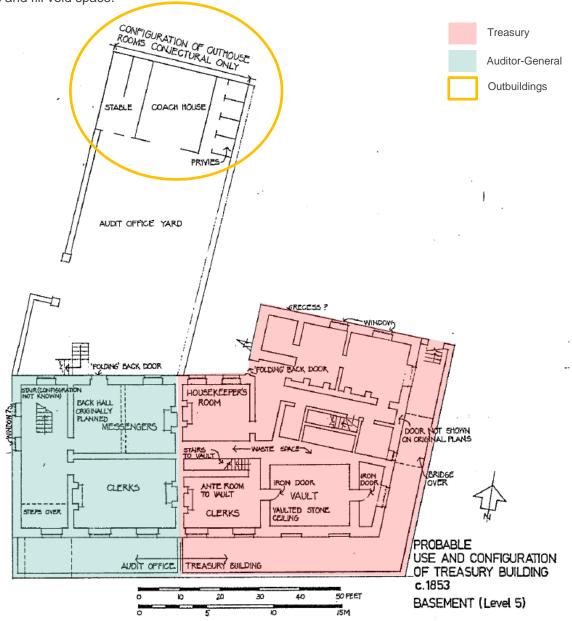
Probable use and configuration of Treasury Building c.1853 (Basement Floor)
